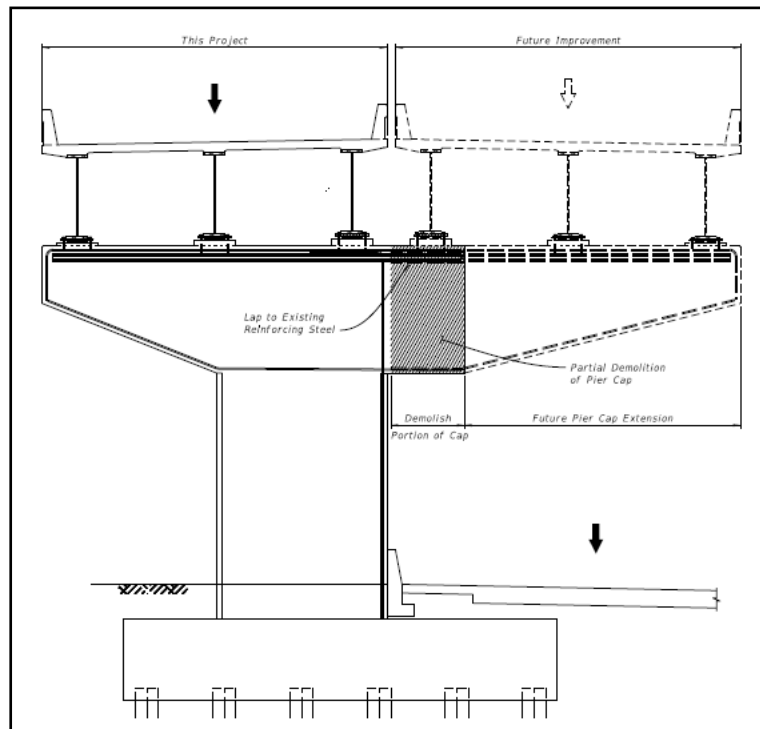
Pier 19 Substructure Overbuild for Future Widening
